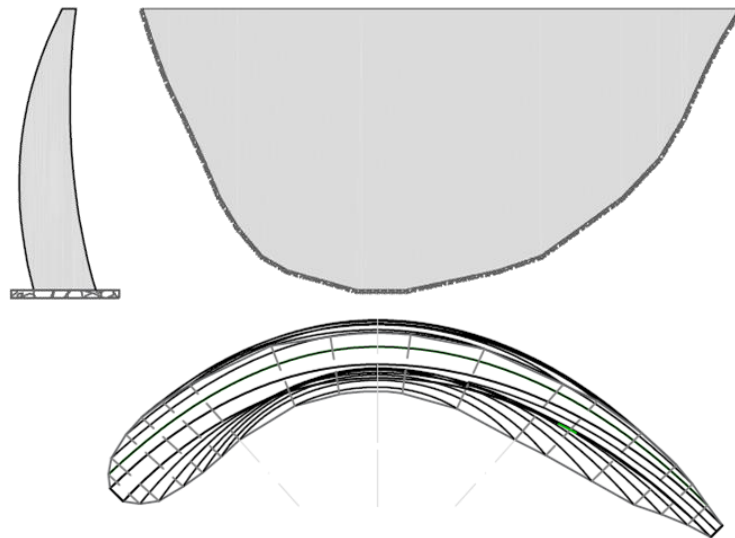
Arch dam, 290 m high. Cross section, front view and plan view.
